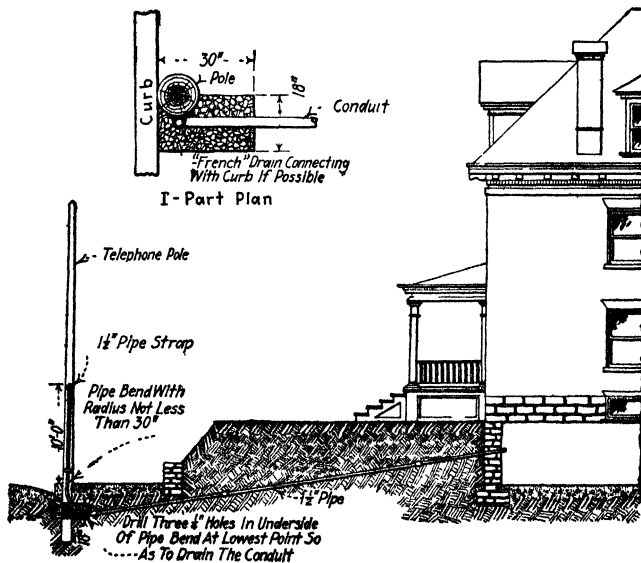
Run of private underground entrance conduit from a pole to the basement of a residence. Drainage is toward the pole due to high location of building. A "French" drain is simply a mat of stones, which are about 2-in. in diameter intended to provide space between the stones for drainage.
